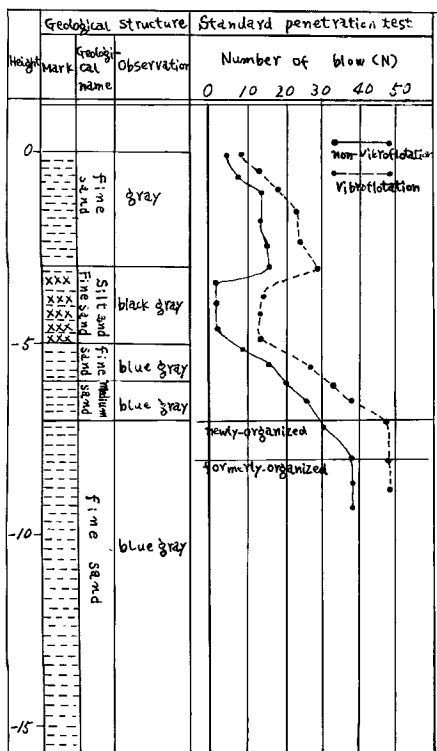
The example of the boring columnar section at Nihon Oil Company's Niigata Refinery.
